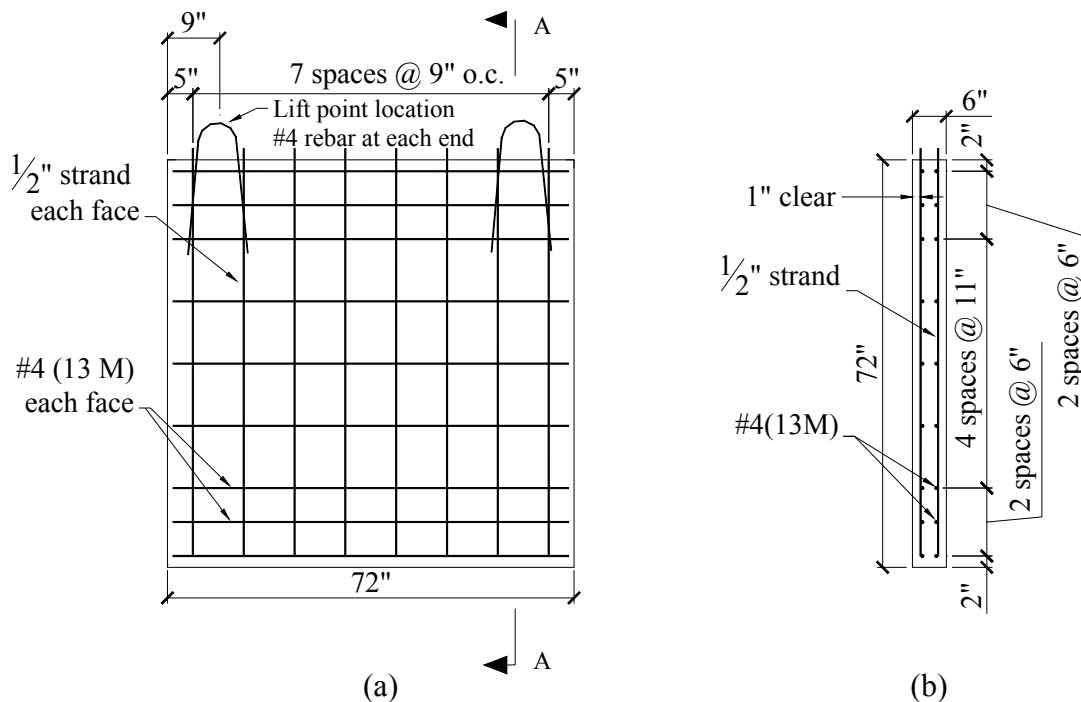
Rebar detailing of wall panels (a) elevation view, and (b) Section A-A
